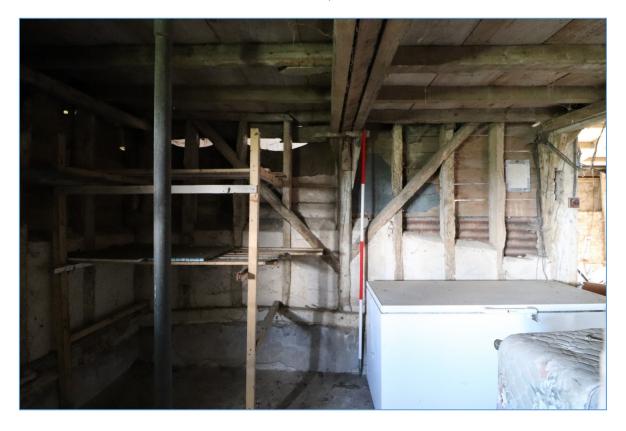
The southern elevation of the eastern bay, looking south, showing the surviving timber framing with render infill.
